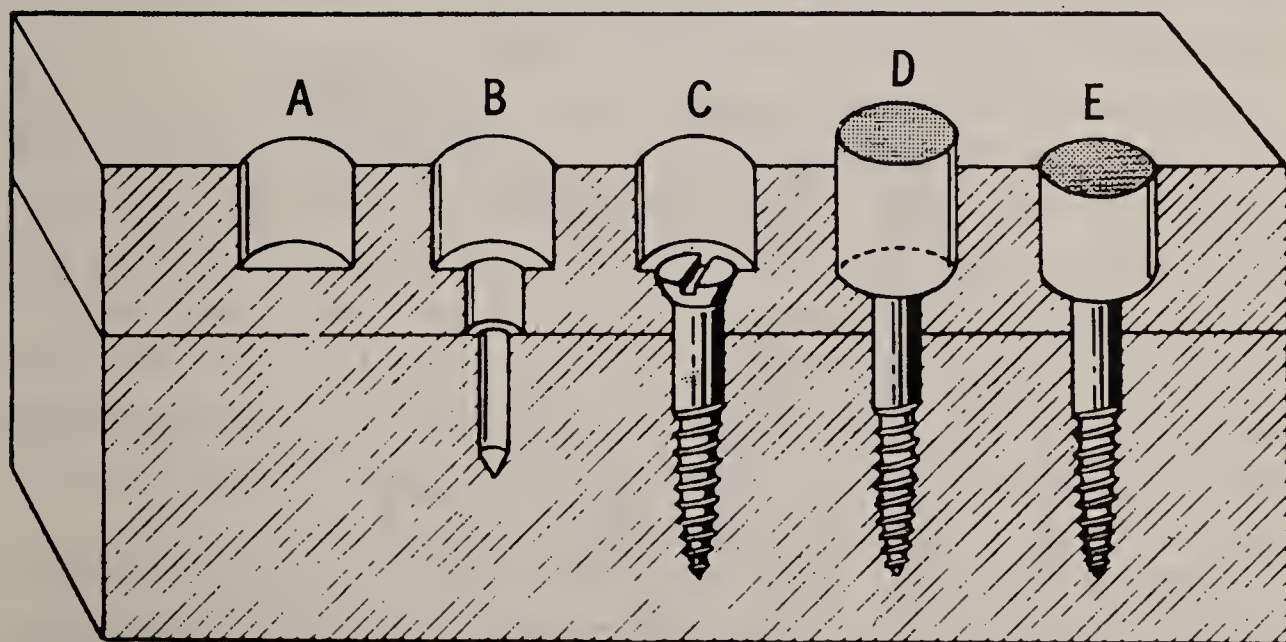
Step-by-step method of concealing screw heads by means of wooden plugs. A, bore hole to fit wood plug; B, bore pilot and shank holes for screws; C, drive screw in place; D, drive in glued plug to project slightly above work surface; E, after glue has dried, cut plug to surface height, then finish by plane.
